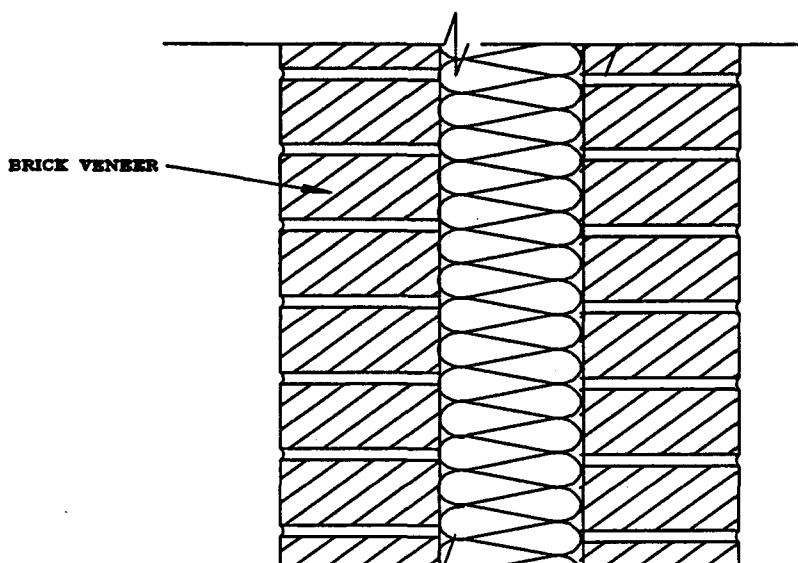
The analyzed wall structure in details. (from the exterior to interior: a 90-mm facade brick, a 120-mm glass-fibre board and finally a 140-mm red brick).
